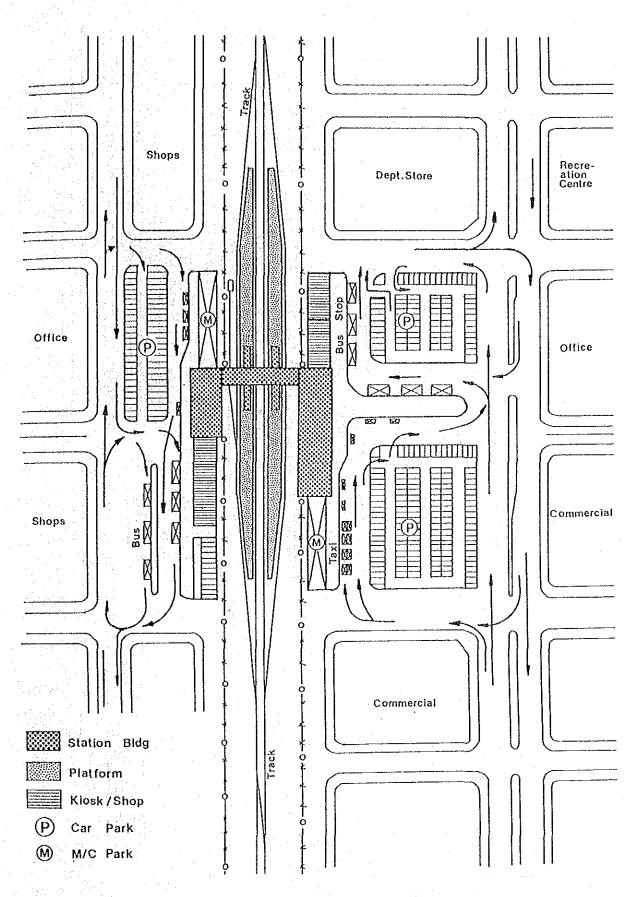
Typical Layout Plan For Station Plaza At Intermediate MRT Station
